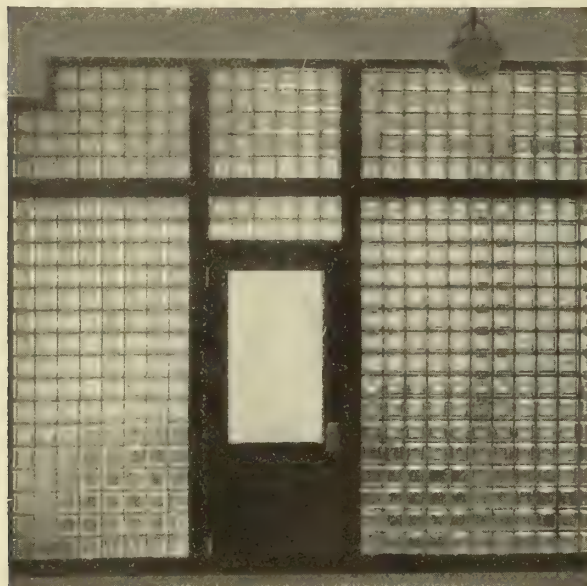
Keppler Partitions transmit light from one room to another, and are an actual source of light for rooms without windows. Translucent, soundproof, fireproof, and ensure privacy
